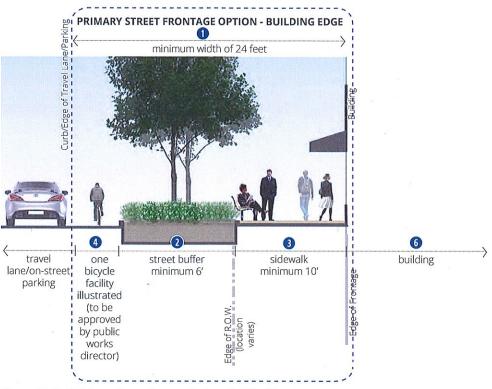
Primary Street Frontage Option - Building Edge
